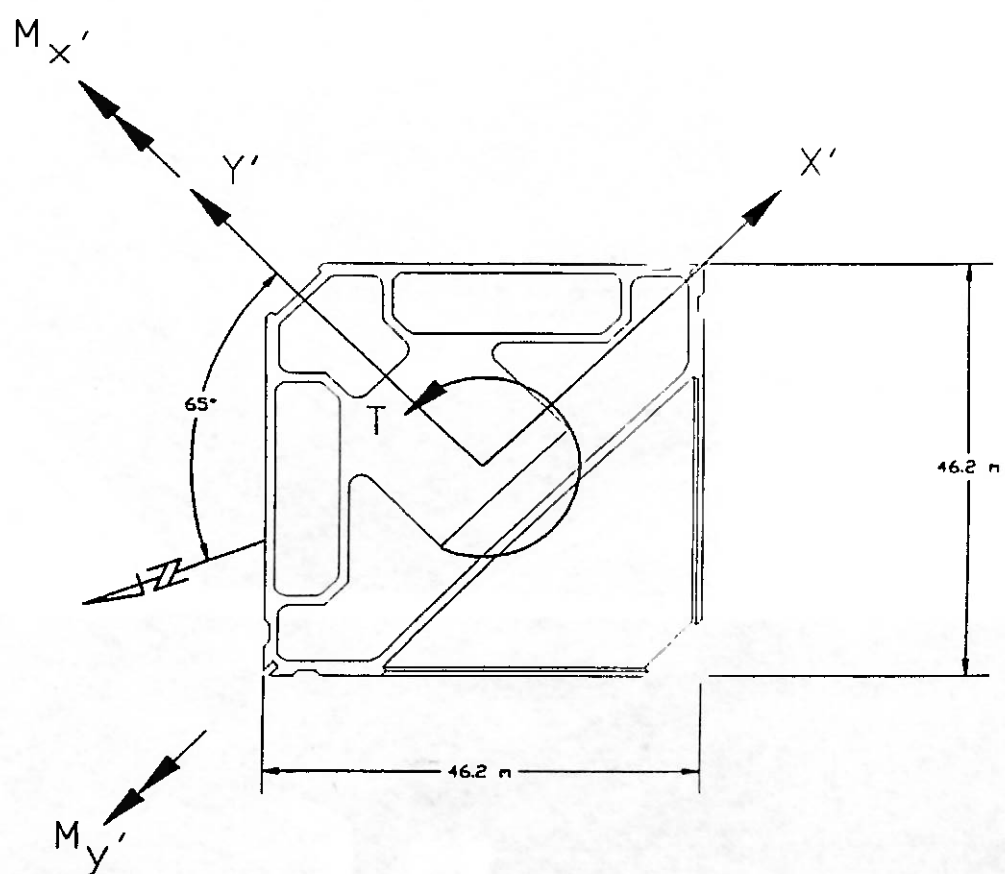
Sign convention used in the study of instantaneous structural wind loads
